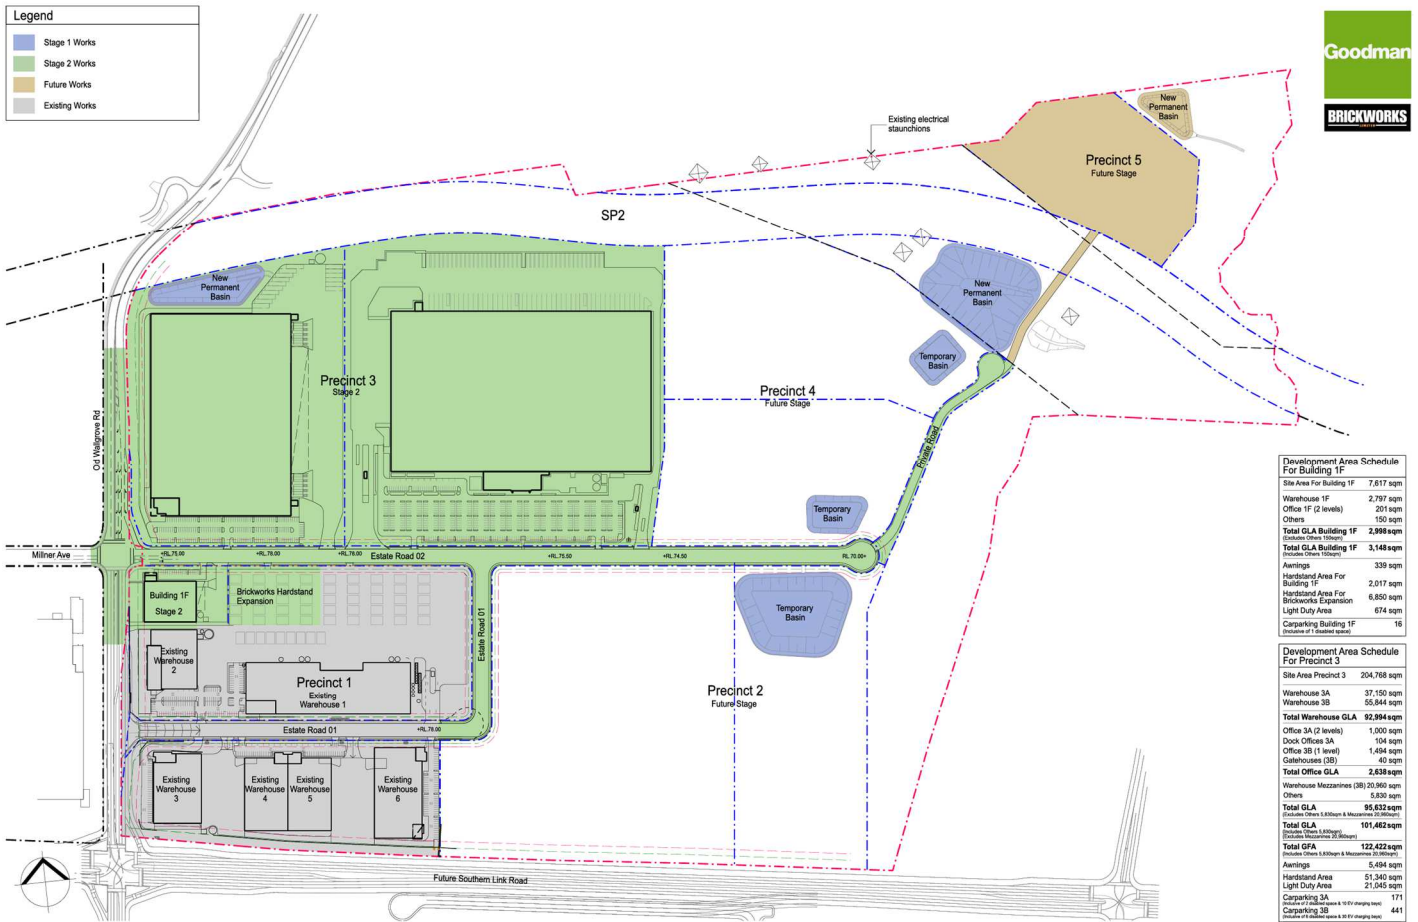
Building Stage Plan (Stage 2 Works) of Oakdale East Industrial Estate
